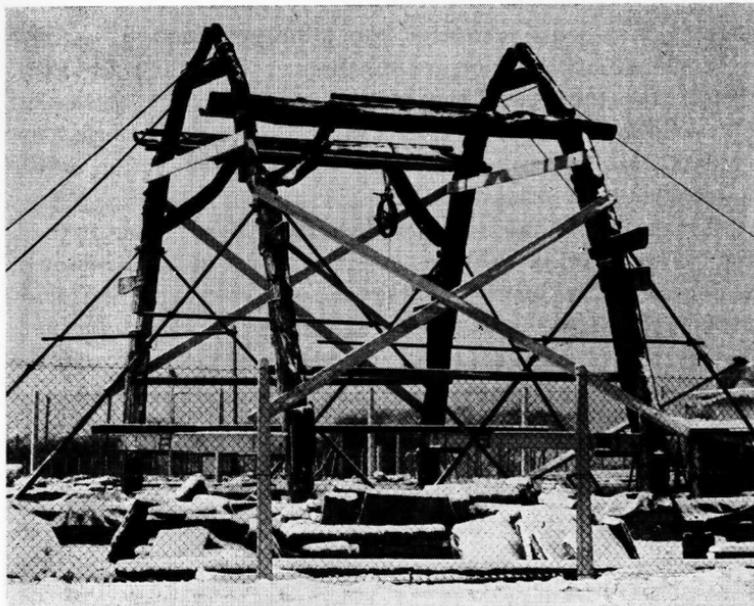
PLATE II. *Newton Hall*: the centre pair of cruck-blades after the removal of the oak frame walls and roof.
